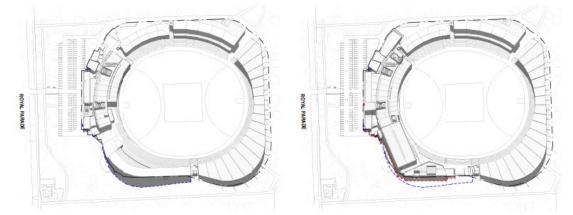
Existing (left) and proposed (right) shadows at 11.00am at equinox. Dotted blue line indicates extent of existing shadows (source: application plans prepared by Populous)
